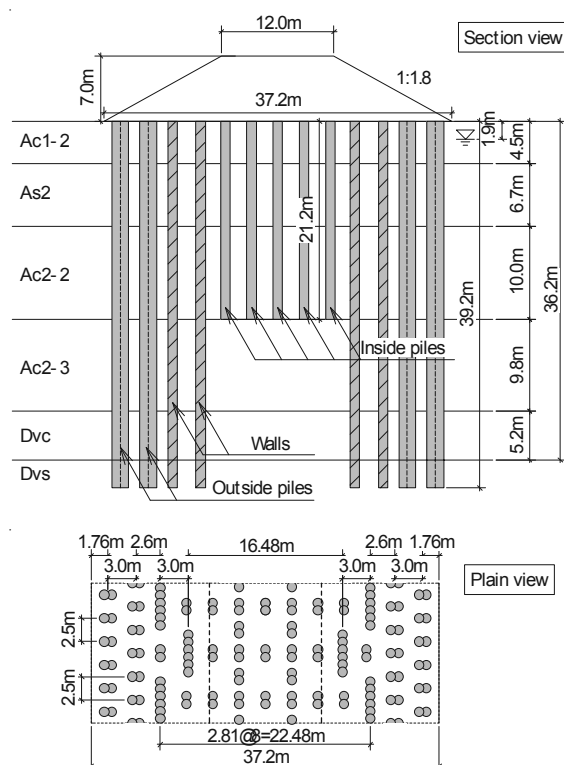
Geological profile and arrangement of the deep mixing columns and walls at the construction site where the method was applied.
